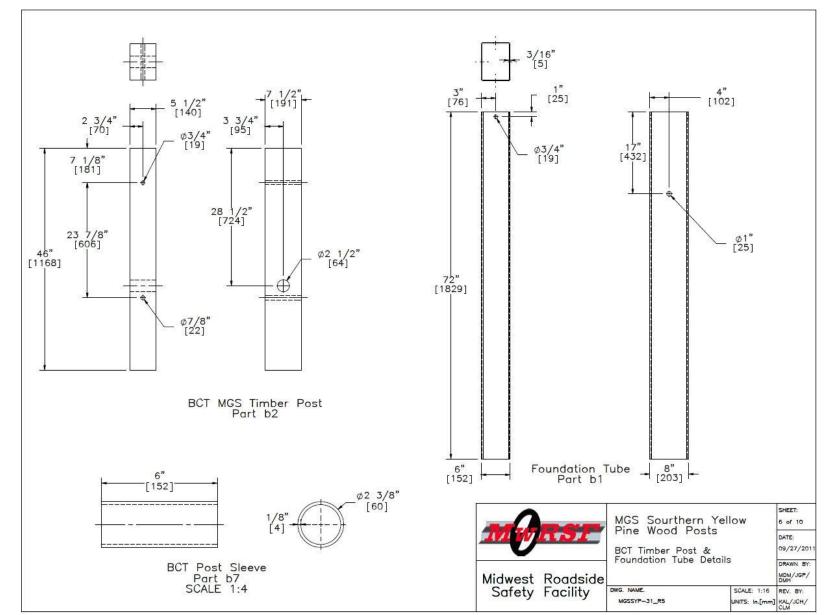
BCT Timber Post and Foundation Tube Details, Test No. MGSSYP-1
